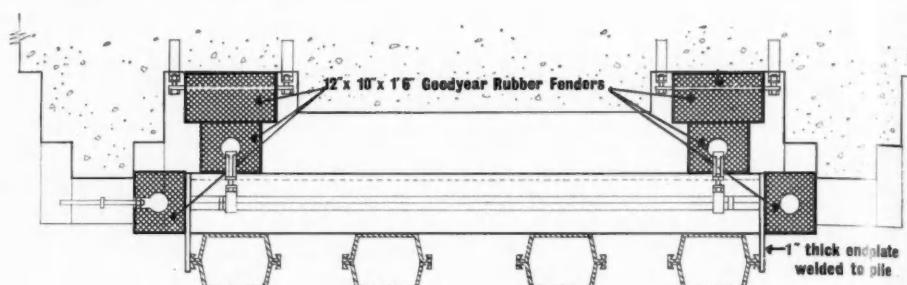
Sectional plan of rubber fender installation at Penang Ferry Terminal.
